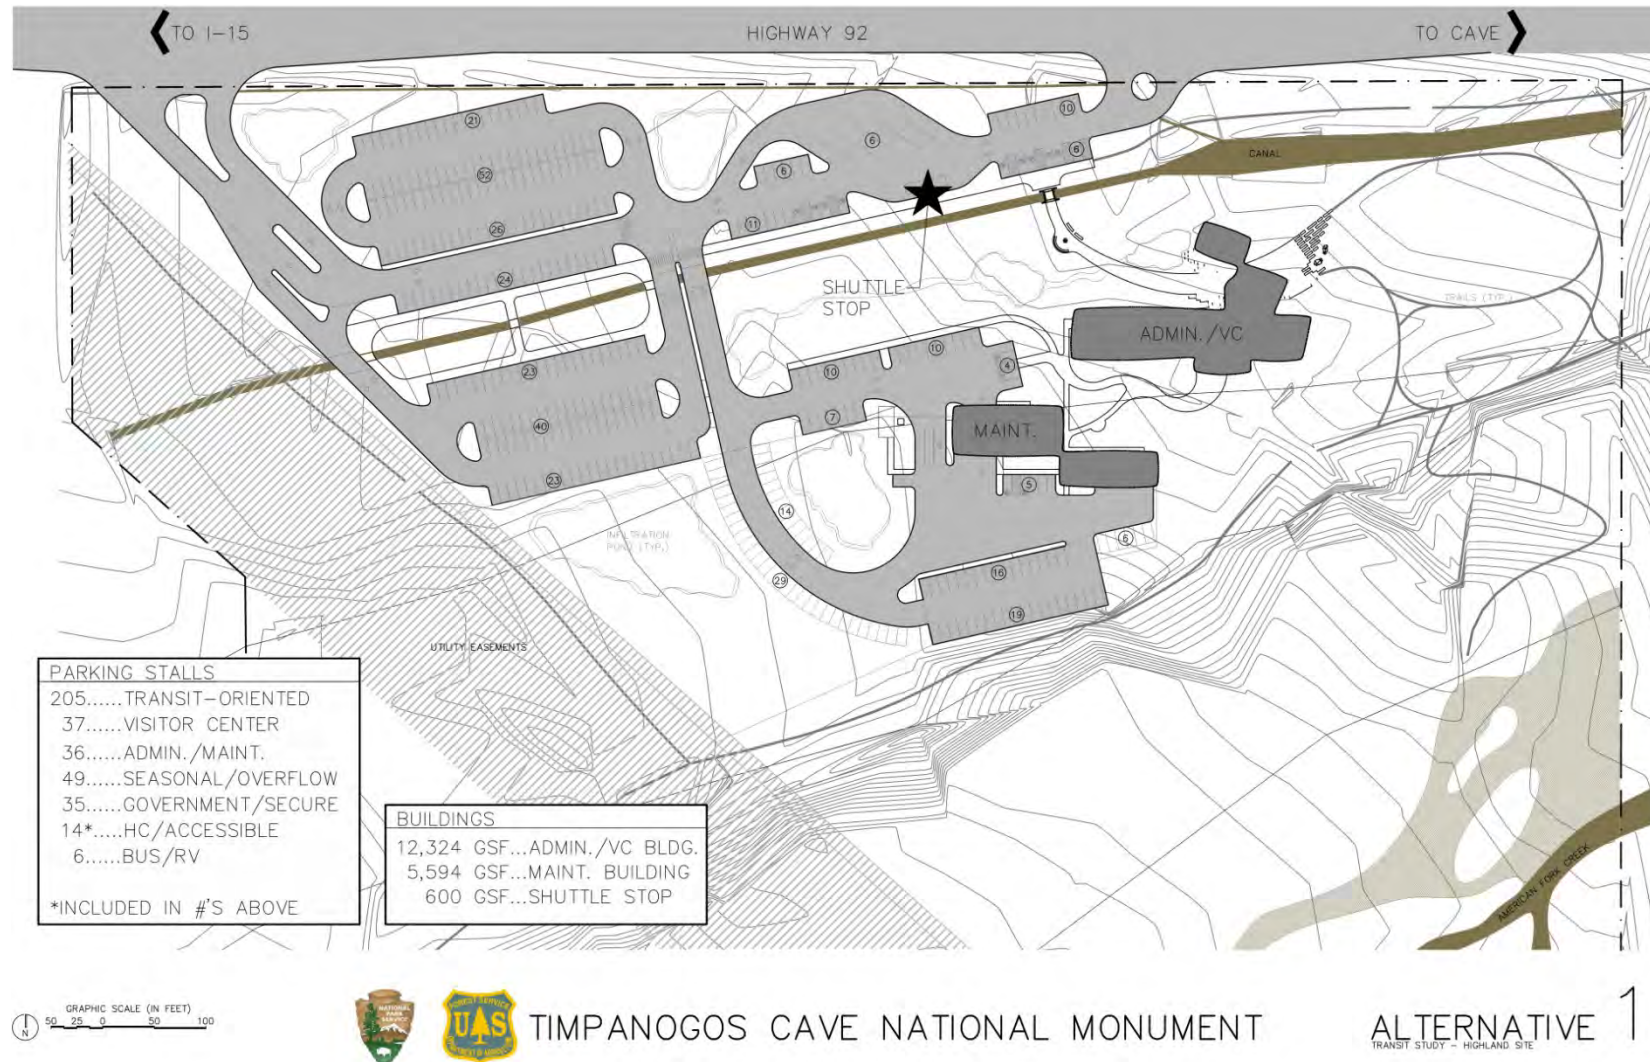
Alternative 1: Canyon Site Schematic Design
